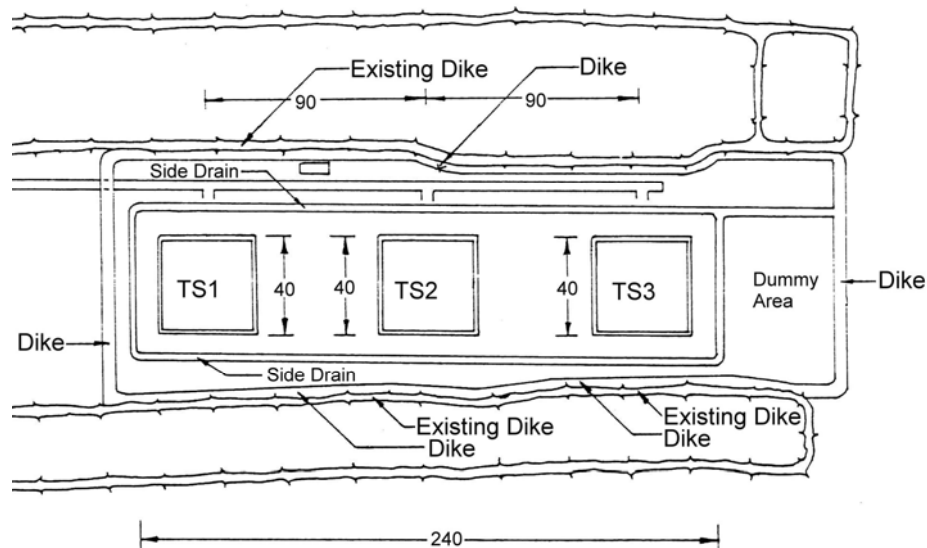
Site plan of test embankments TS1, TS2 and TS3.
